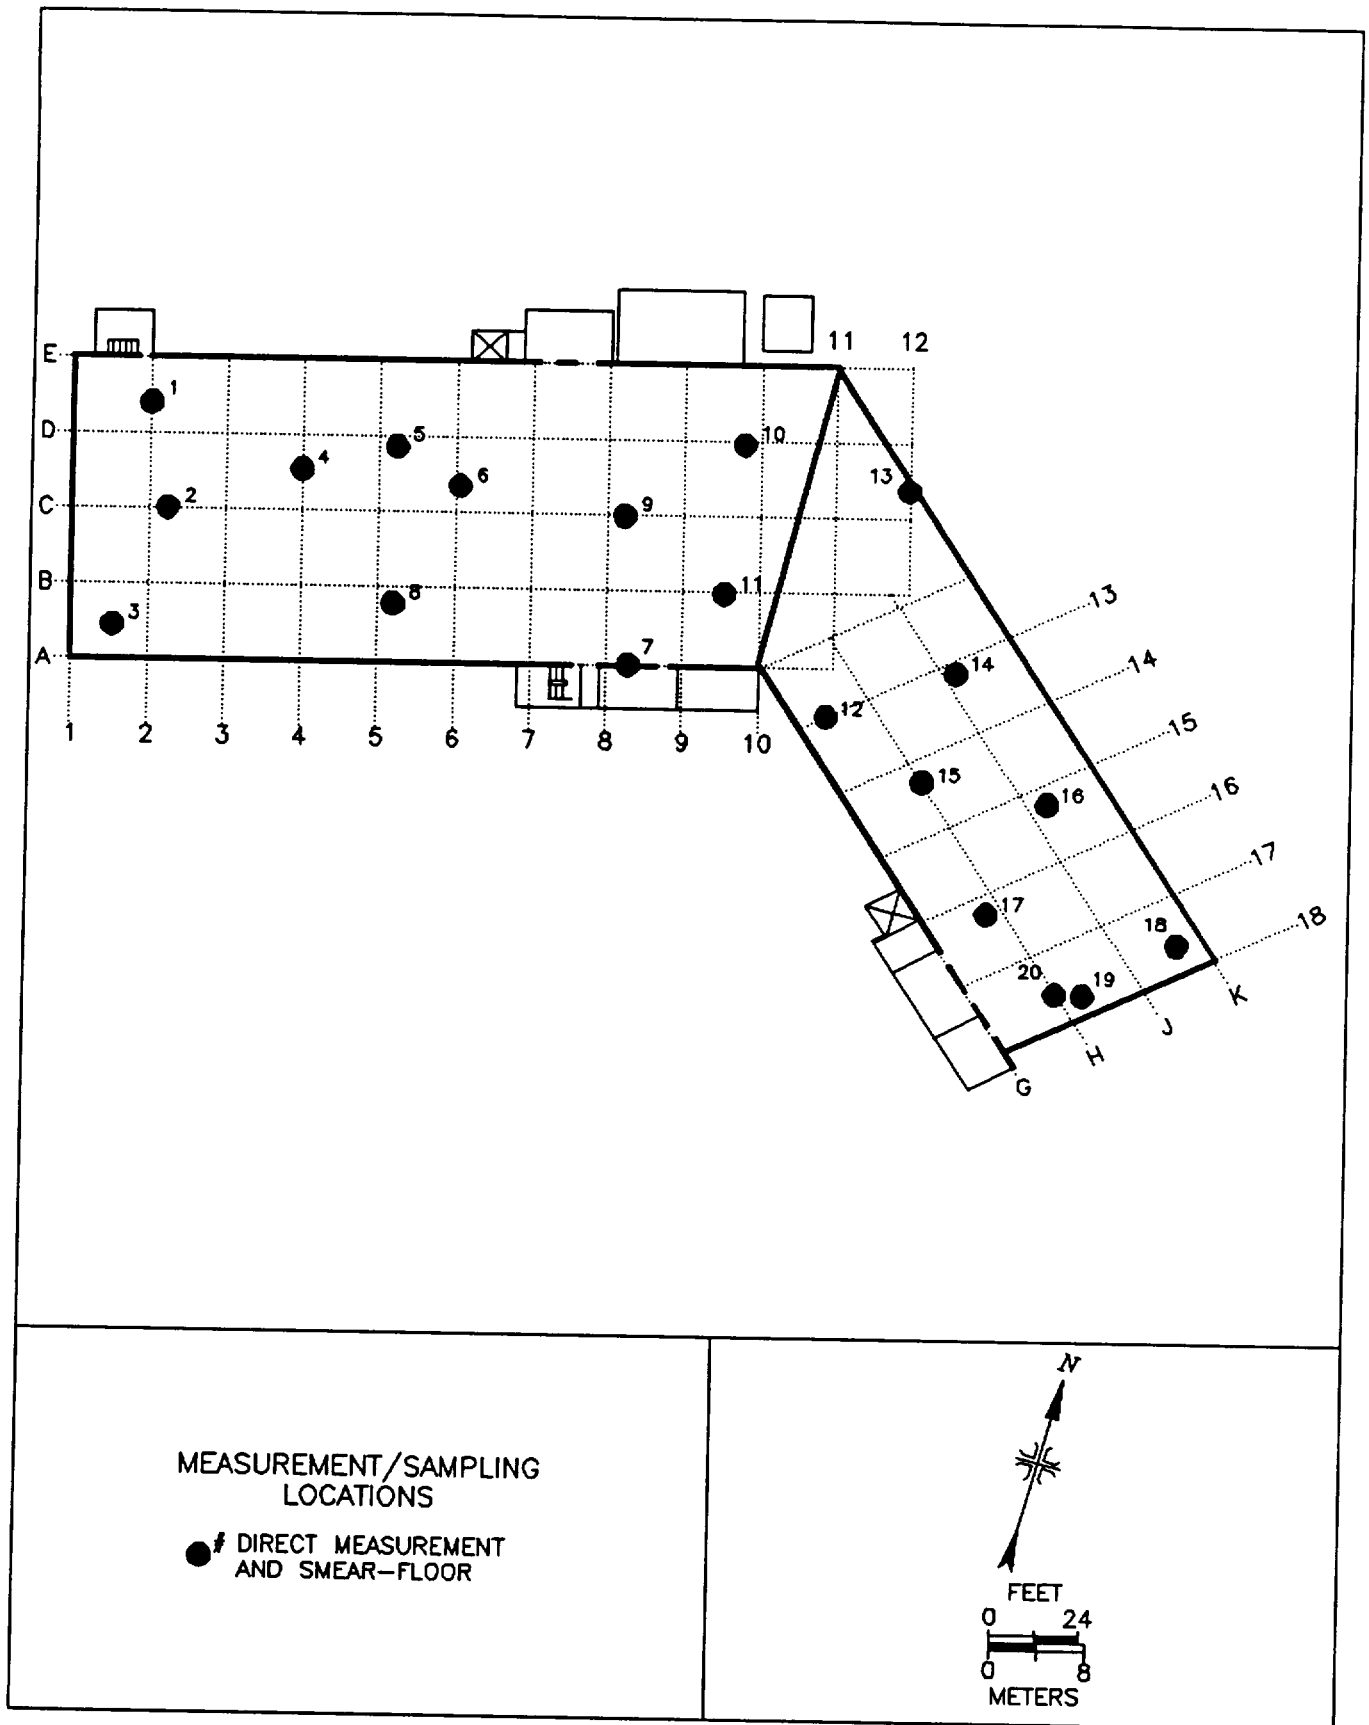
Building 8, Fourth Floor – Measurement and Sampling Locations
